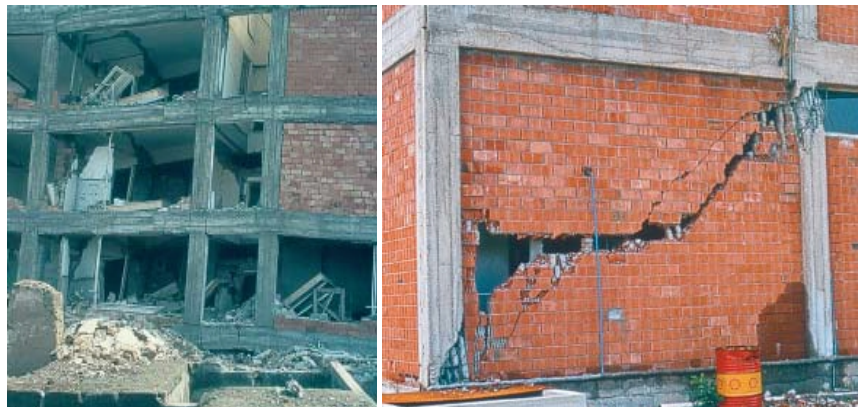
a. Stronger columns lead to the falling out of the masonry (Erzincan, Turkey 1992); 1.b. Strong masonry sheared the columns (Adana-Ceyhan, Turkey 1998)
